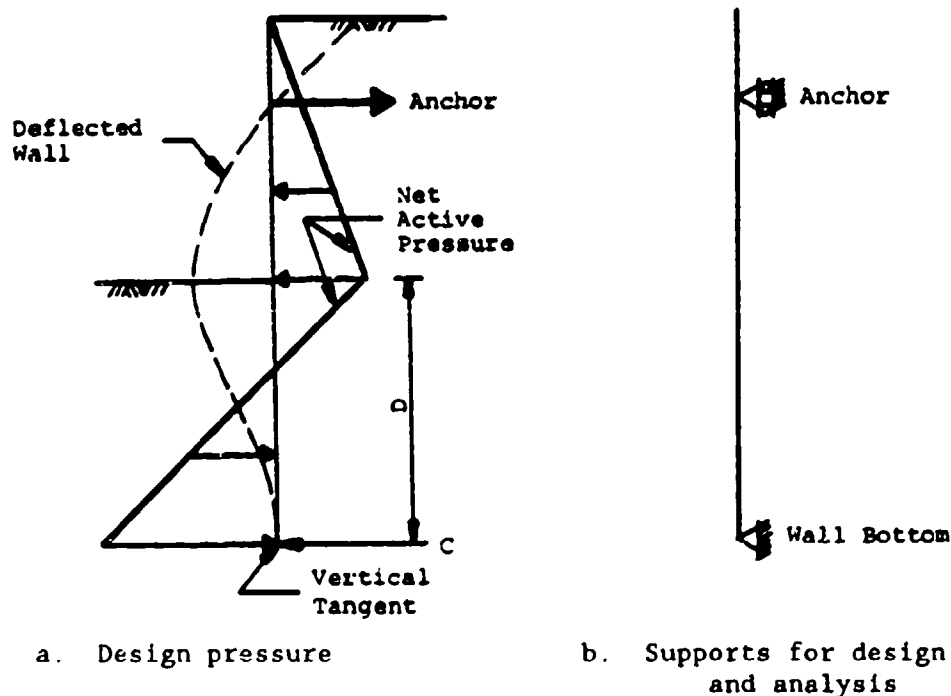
Anchored wall design by fixed earth (Terzaghi 1943) method
